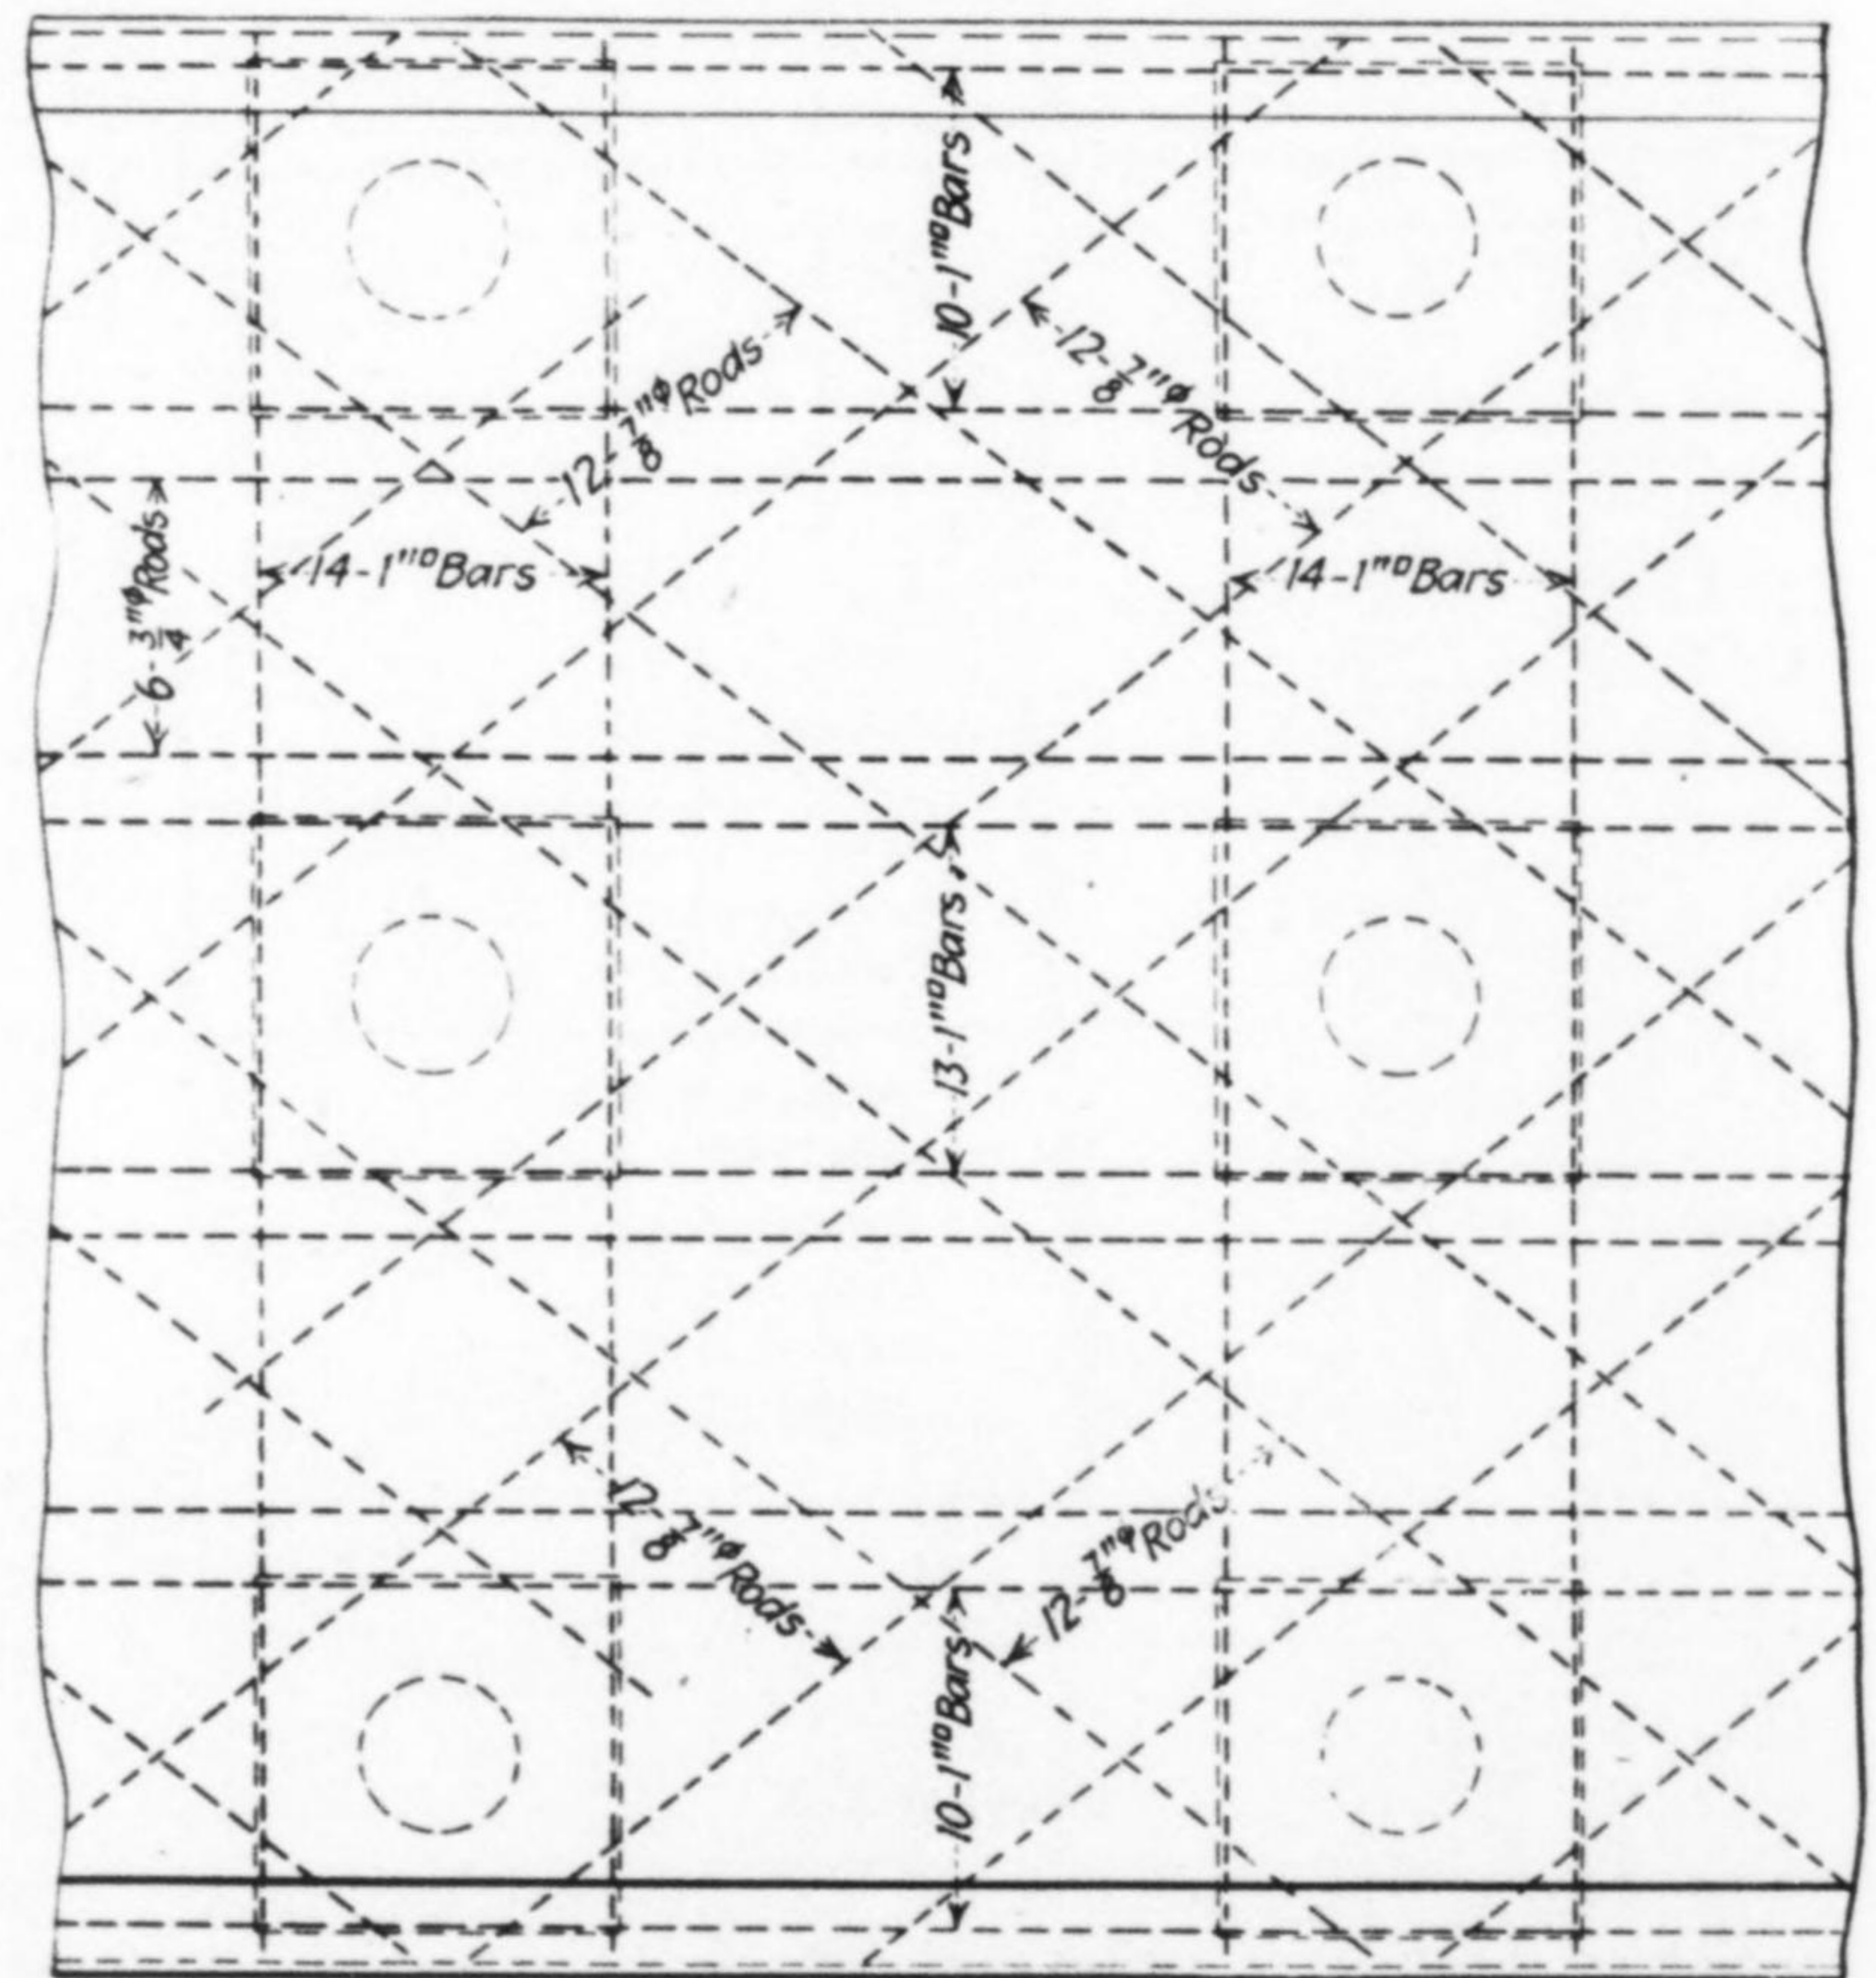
TYPICAL REINFORCING DETAILS FOR FLOORS OF FLAT SLAB CONSTRUCTION
